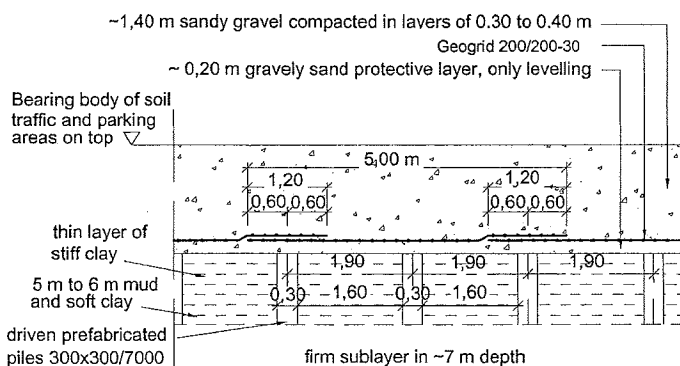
Cross-section “Shell-Station” in Sofia.
